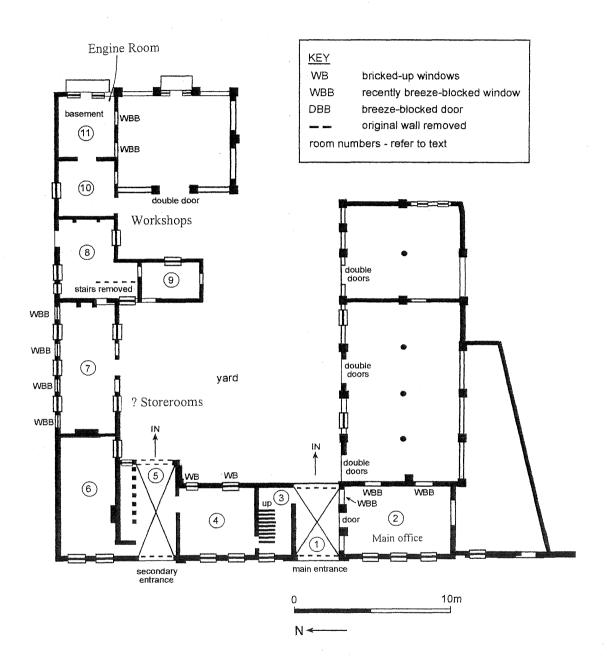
Ground floor plan (Based on original drawings by BLB Architects of Redditch)
